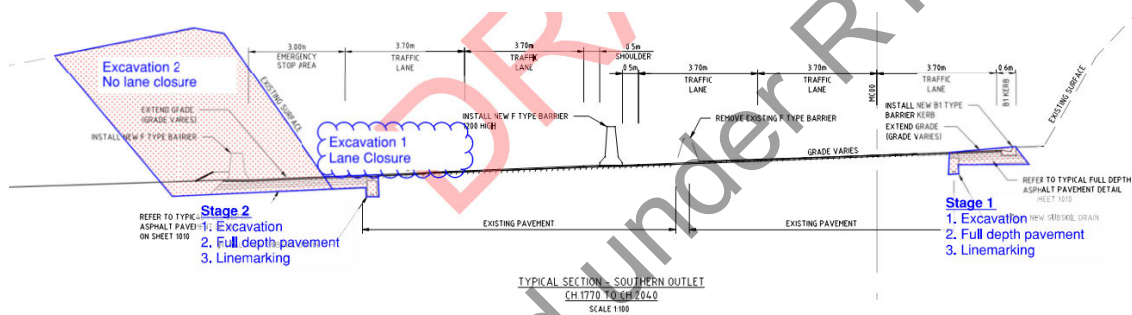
Typical section – Southern Outlet Ch. 1770 to Ch. 2040
